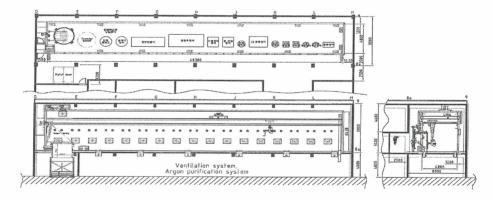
PRIDE Operating Floor Plan and Sectional elevation View
